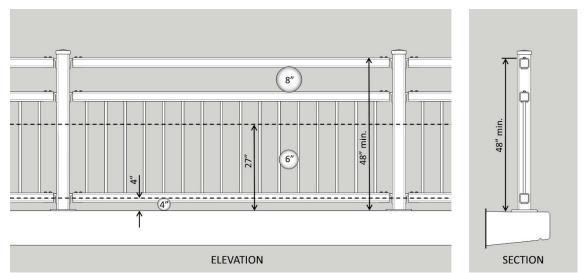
Example bicycle railing showing minimum height and pass-through protection requirements (see Project Nos. BRFN-065-7(39)--39-35, Design No. 120 Franklin and BRF-028-2(45)--38-77, Design No. 125 Polk for similar railing applications)
